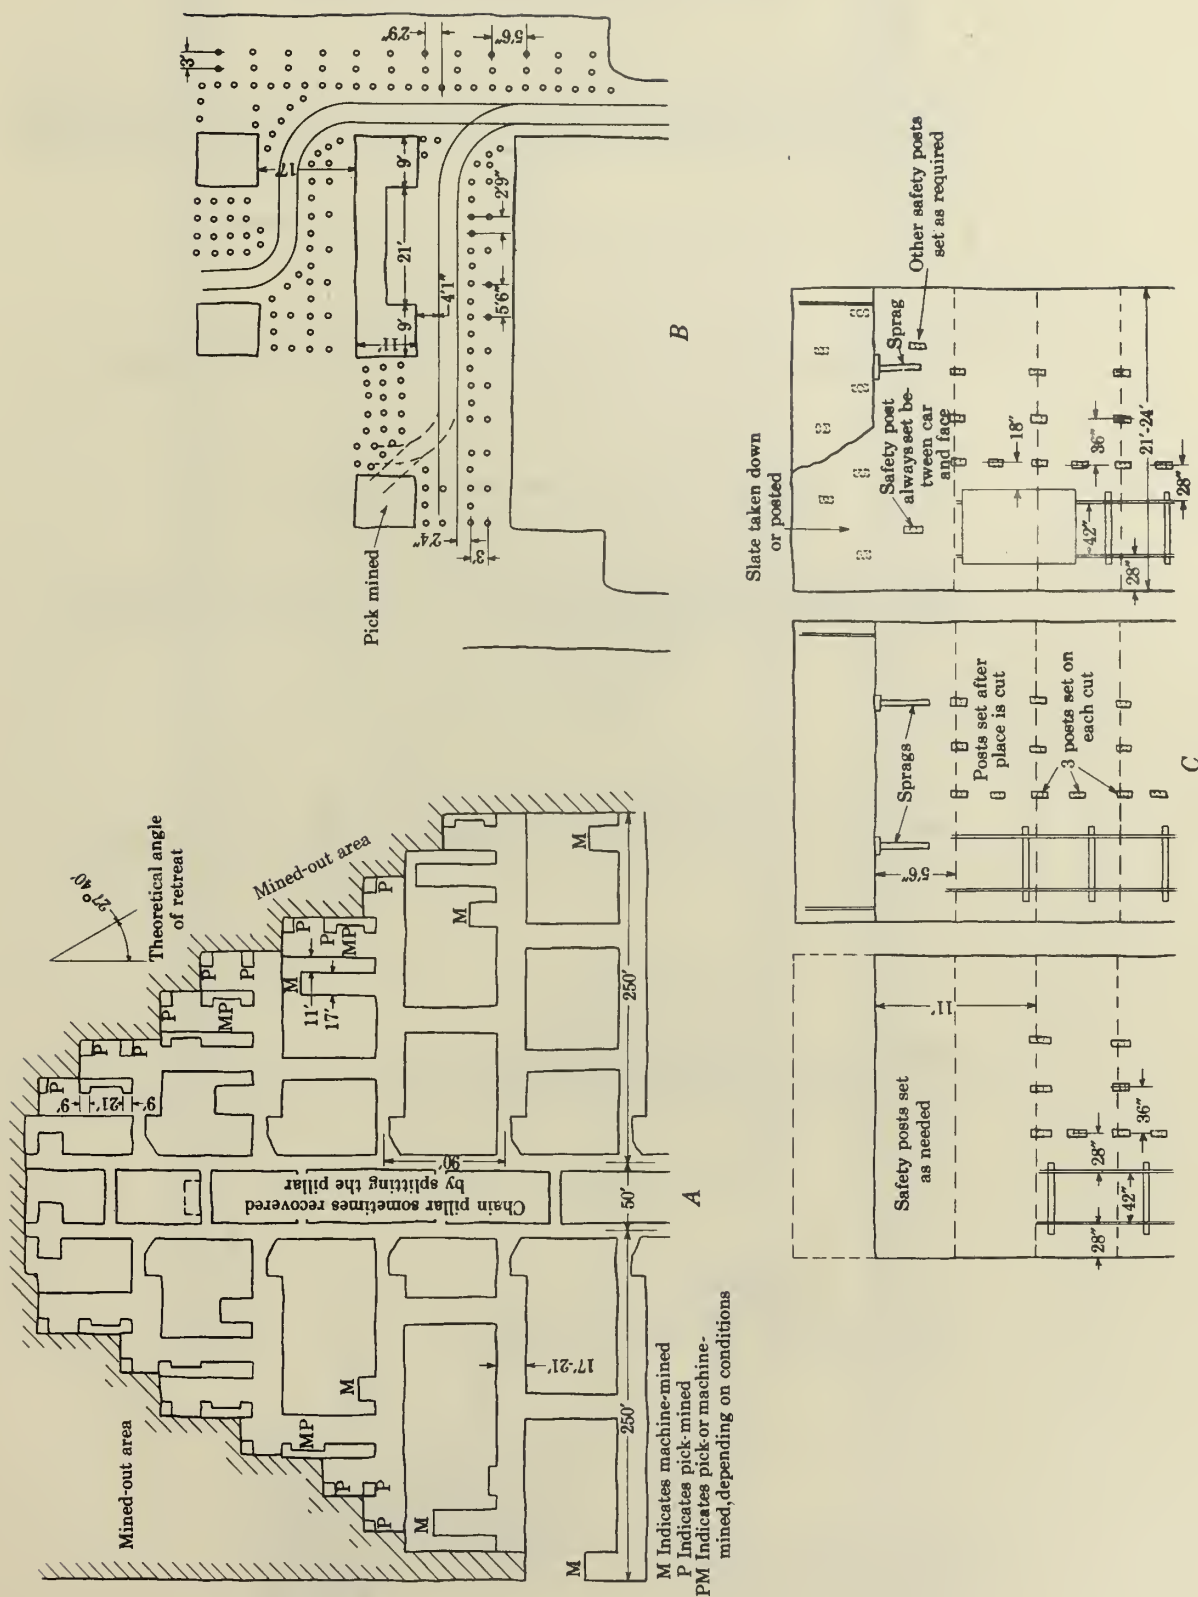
Details of pillar extraction and timbering, type C mines: A, Details of pillar extraction on butt entry; B, details of timbering in pillar work; C, method of timbering in rooms.
